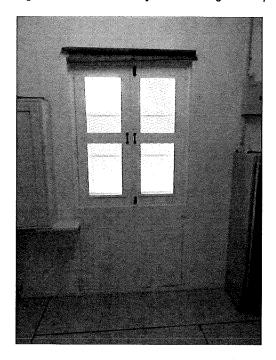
ACMA Facility Main Building interior casement window and optional door way.
